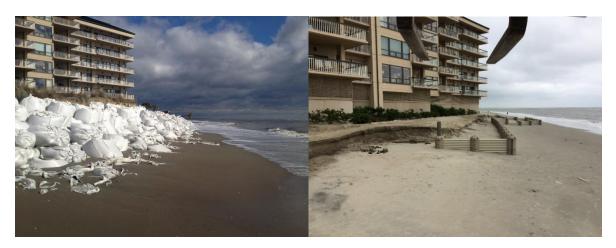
Sandbags and WDS providing erosion and building foundation protection.
